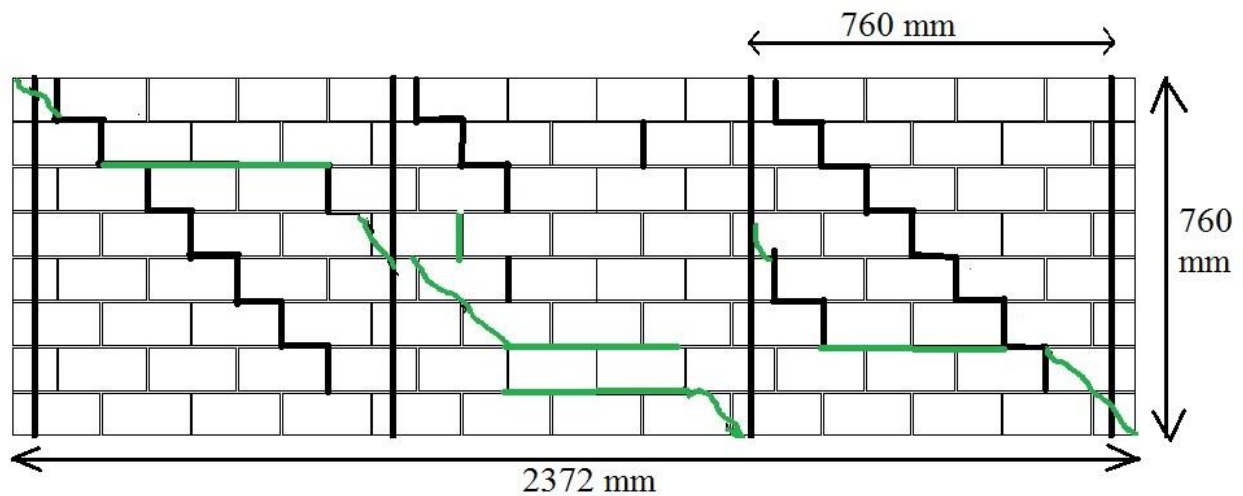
Cracking pattern: panel action (Hamedzadeh (2013))
